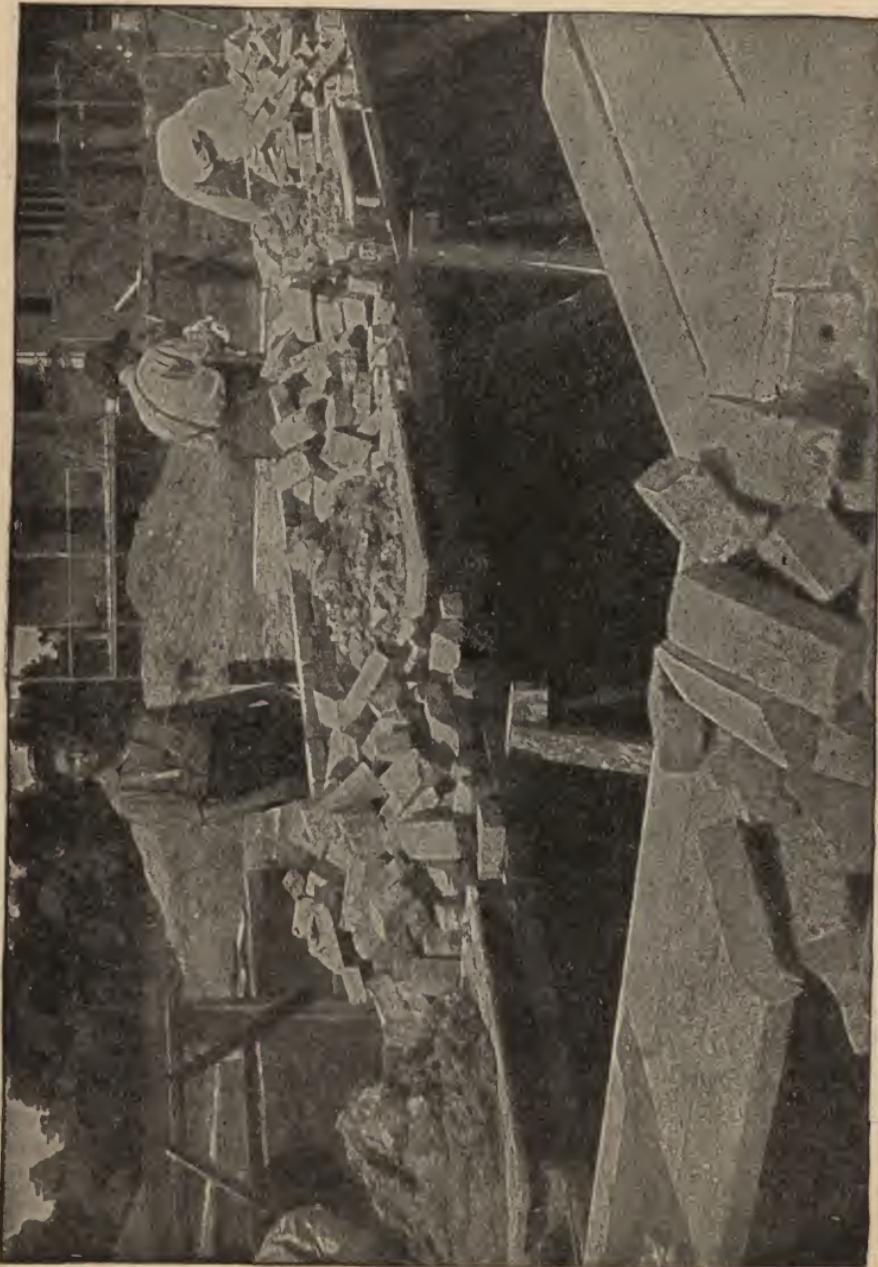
,955.—A typical scaffold on a typical house job, showing placement of the mortar and brick in alternate piles. Note the mortar boards.
